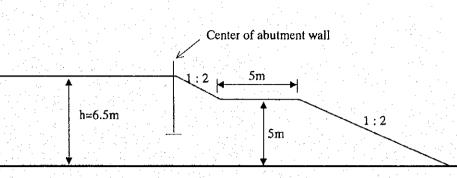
Longitudinal Section of Fill before Preparation of Pilling for West and East Approaches to Viaducts
